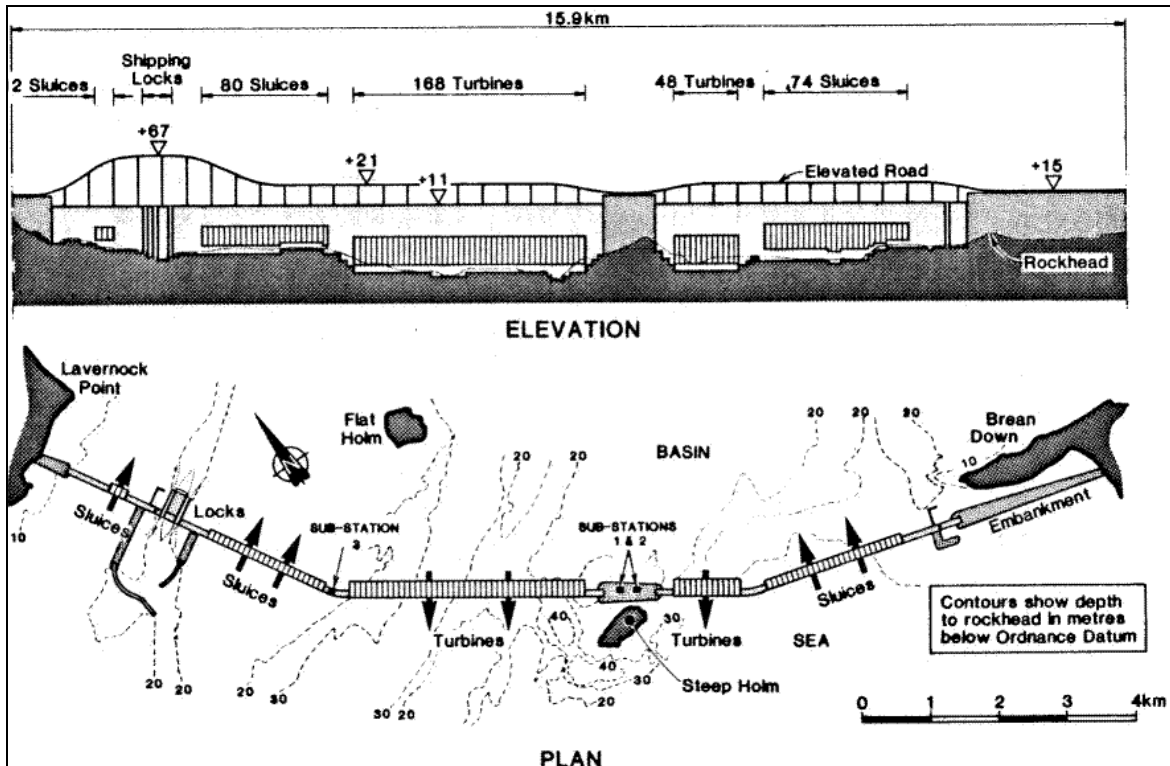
(4): Layout of Severn Barrage as proposed by STPG
